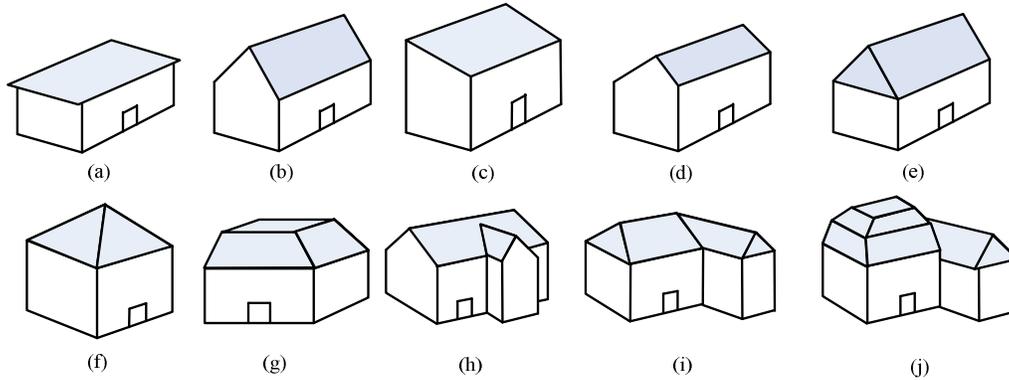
Typical 3D roofs. (a) a flat roof, (b) a gable roof, (c) a shed roof, (d) a saltbox roof, (e) a hipped roof, (f) a pyramid roof, (g) a mansard roof, (h) a cross gable roof, (i) a cross hipped roof, and (j) a complex composed roof.
